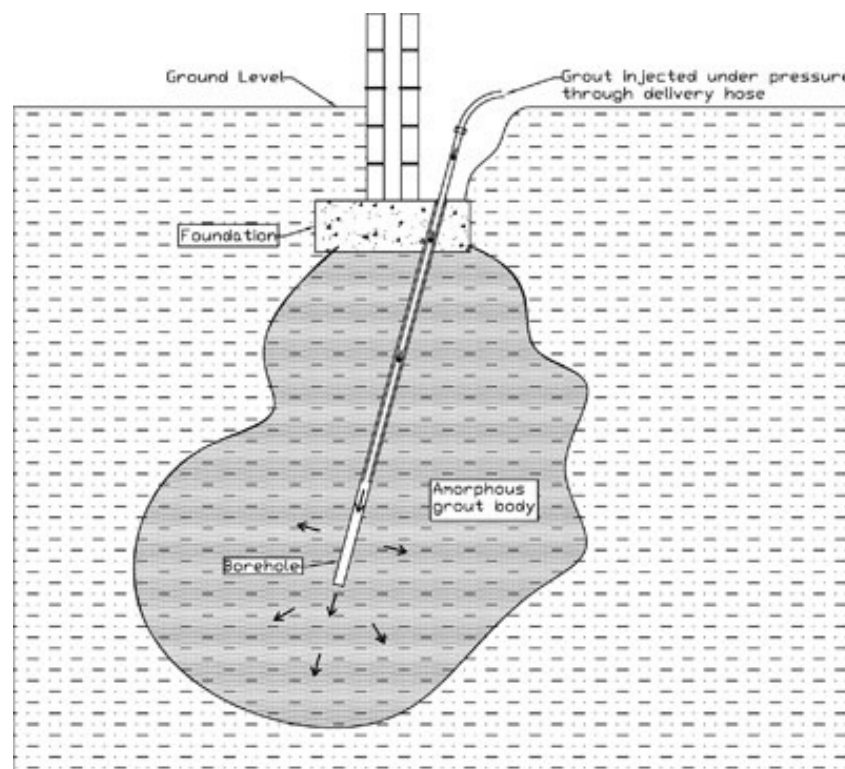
Impression permeation grouting (Substruck Ltd., sd)
